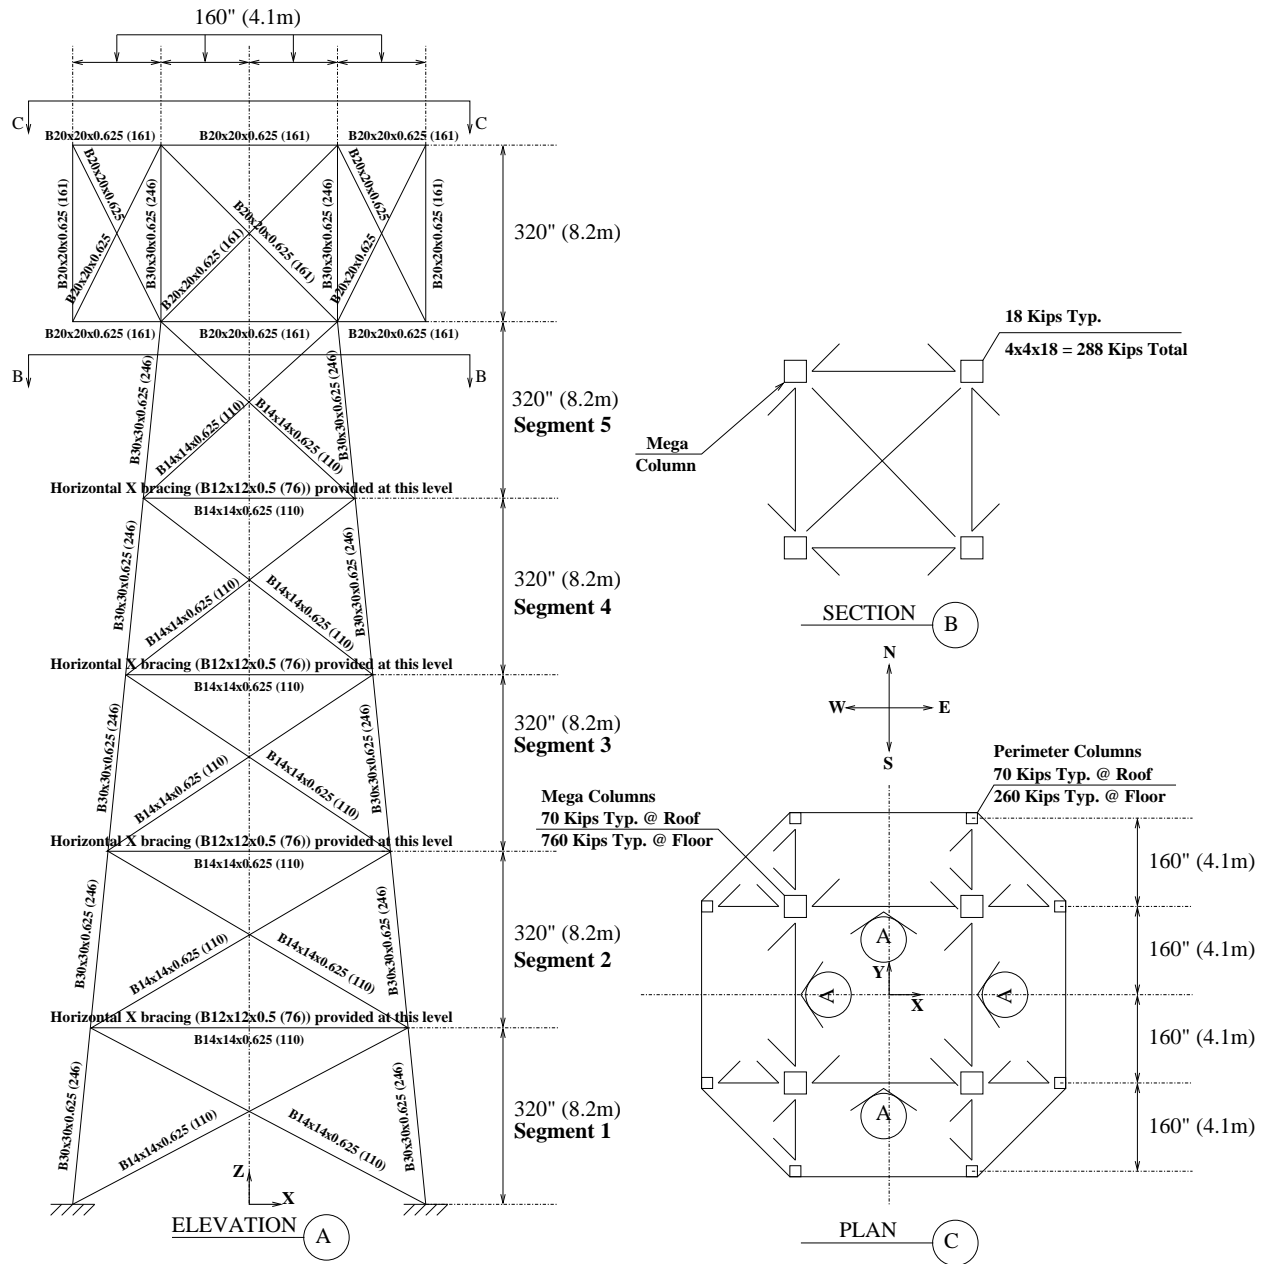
Structural plan, section, elevation, and member sizes of the proposed benchmark water-tank problem. Note that the X-braces are assumed not to be connected at the intersecting point.
